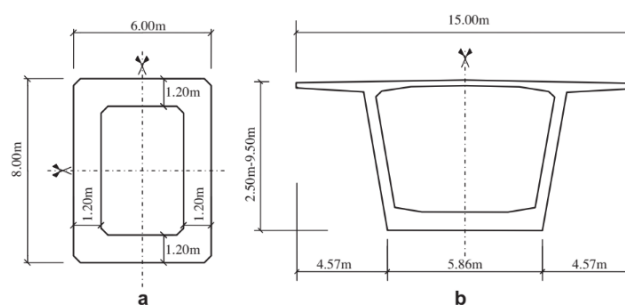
Cross-sections of (a) piers and (b) deck of the Budan Bridge.
